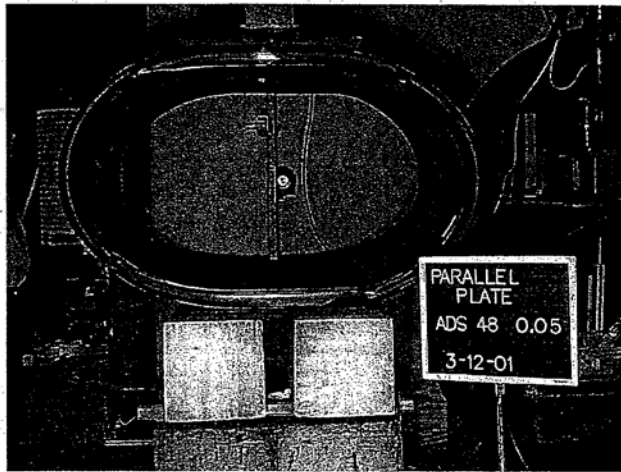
Deformed Shape of HDPE ADS 48" Pipe at Vertical Deflection of 20% Diameter
